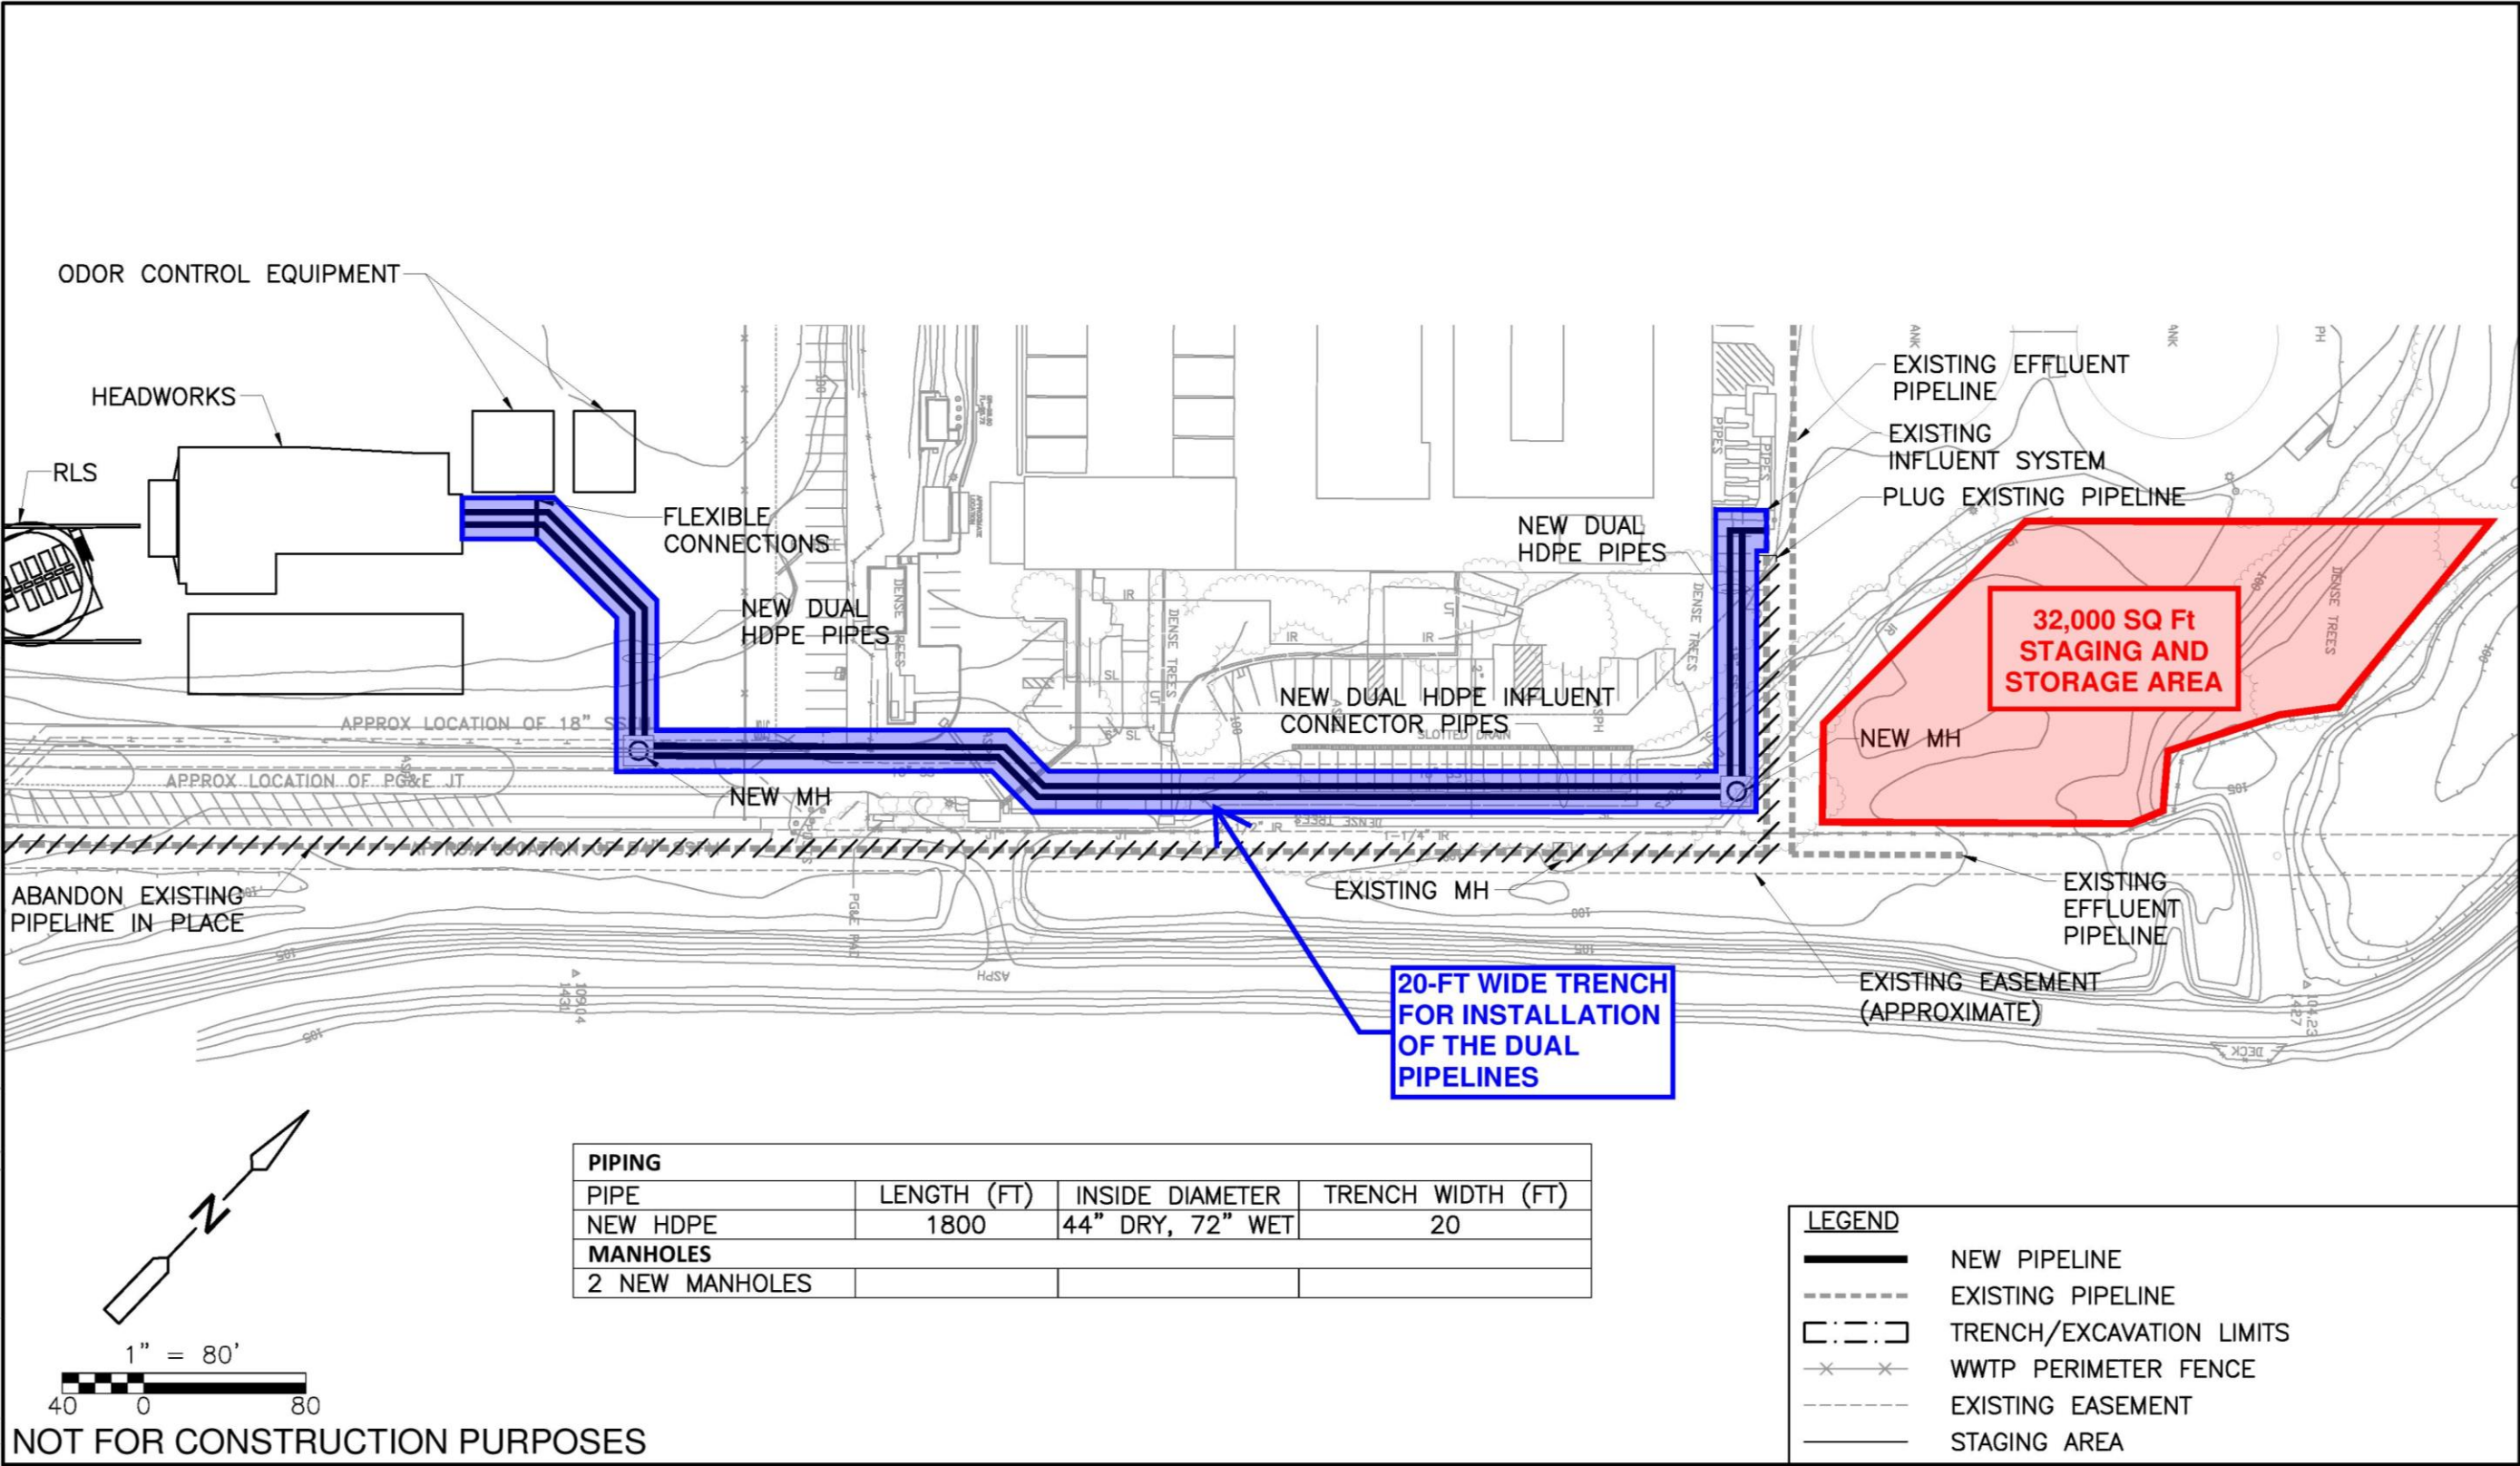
ICP Alignment, Staging and Storage Area, and Construction Trench
